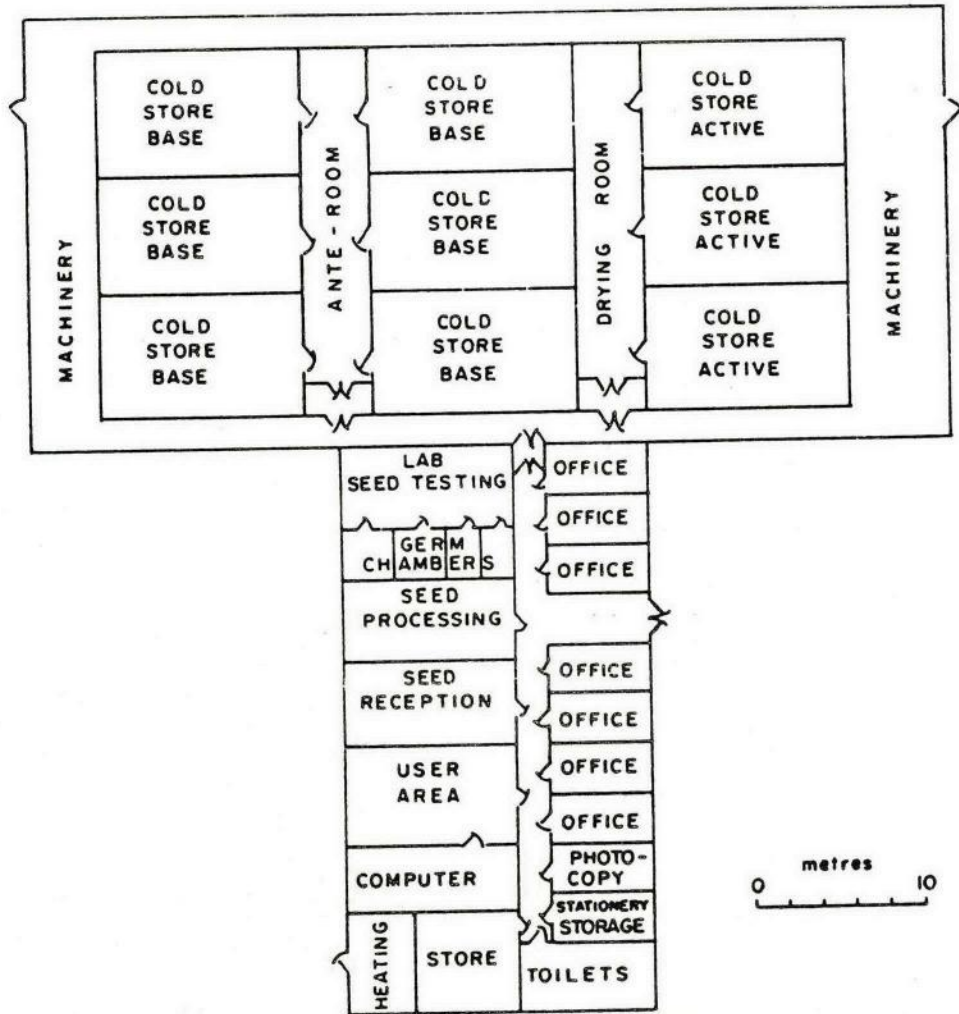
FLOOR PLAN OF GENE BANK WITH BASE AND ACTIVE COLLECTIONS
